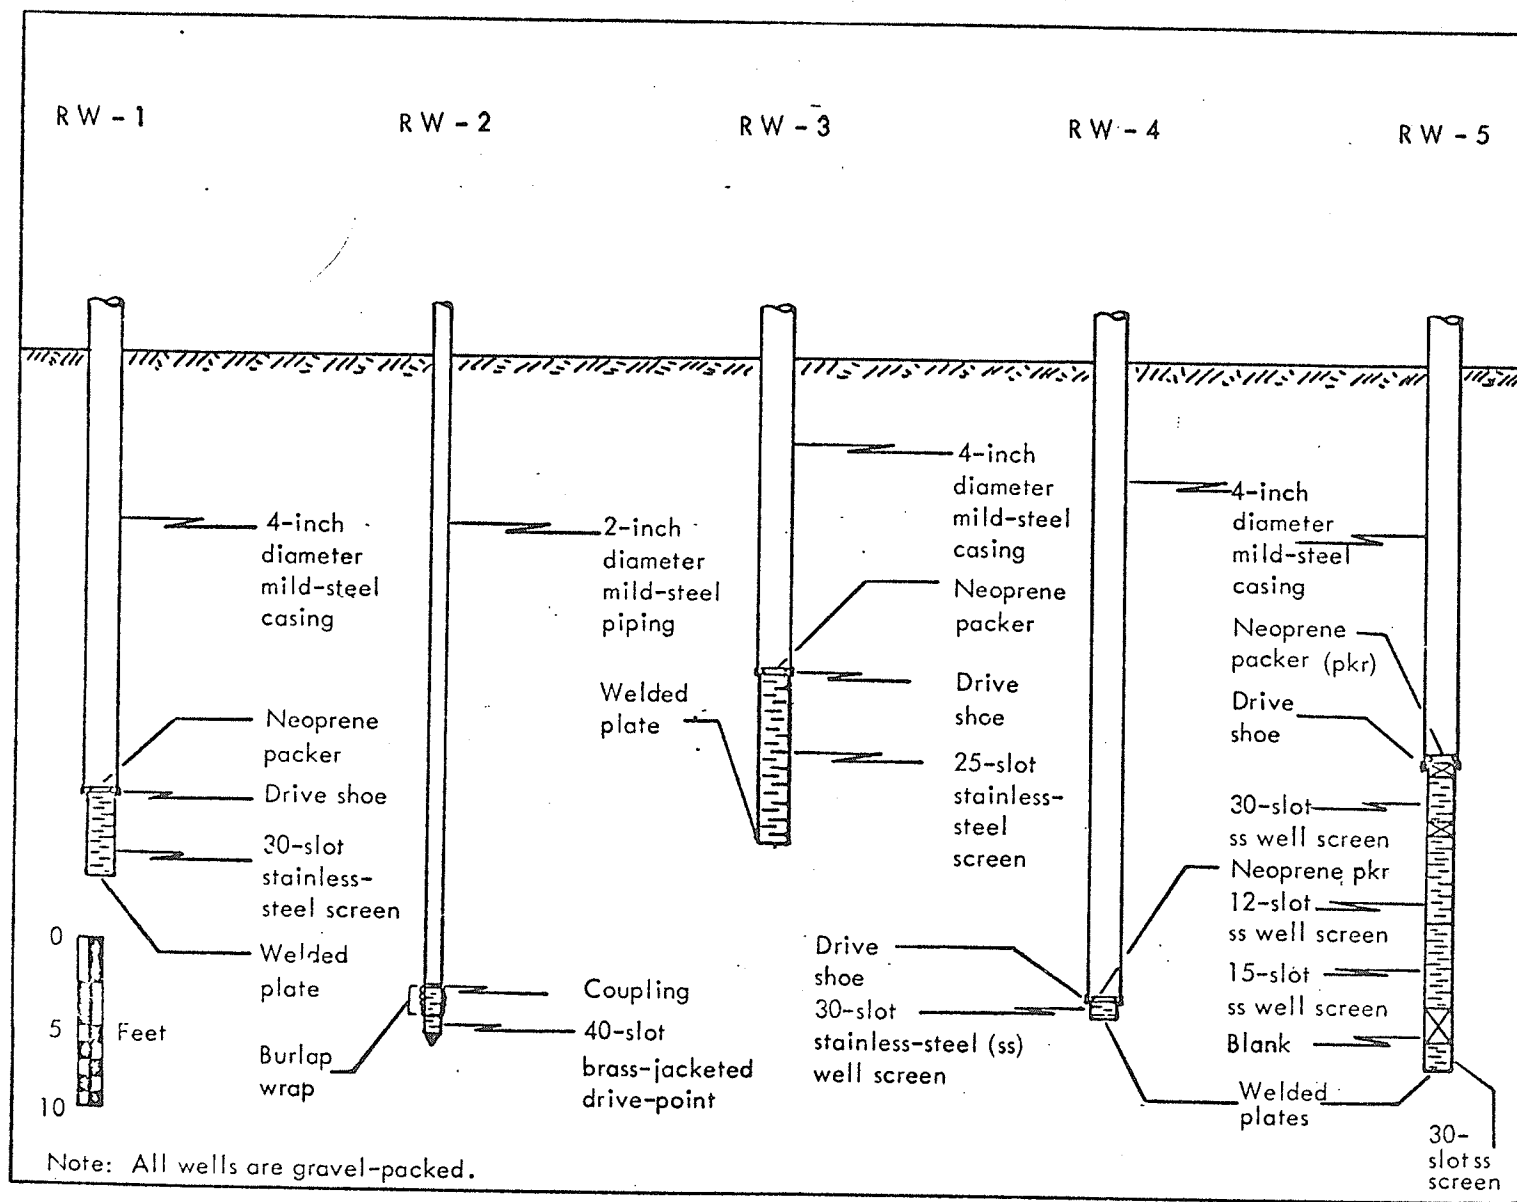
Construction details of the observation/pump wells installed at the WNRE Waste Management Area.
